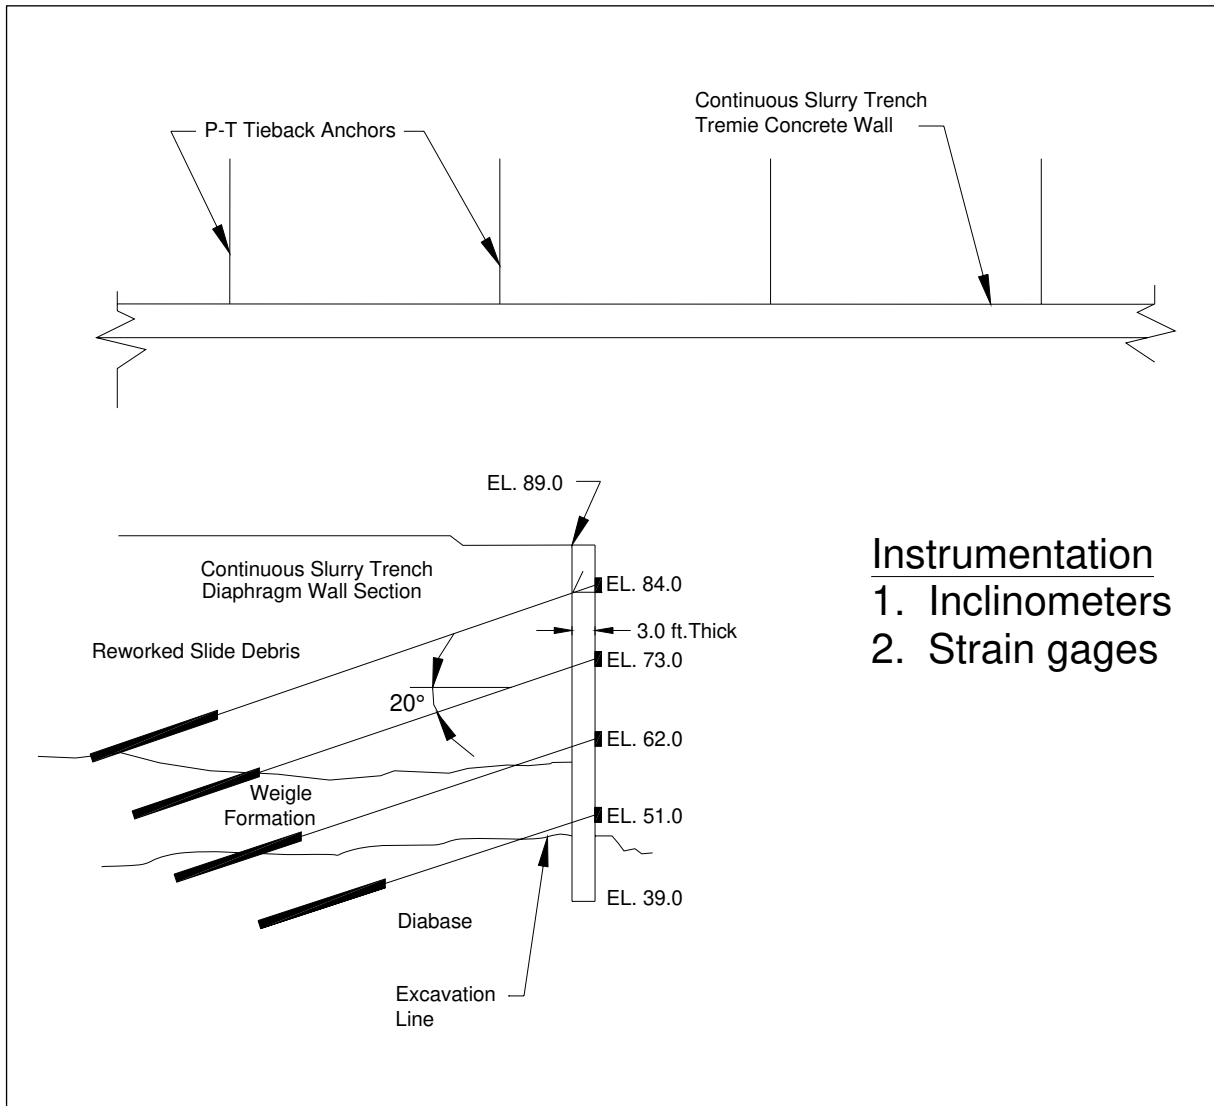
Plan and section view of slurry trenched tremie concrete wall with post-tensioned tieback anchors
